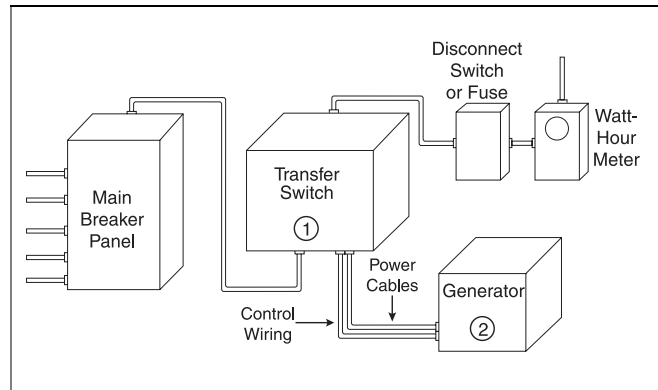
Typical Installation of a Residential or Light Commercial ATS.
